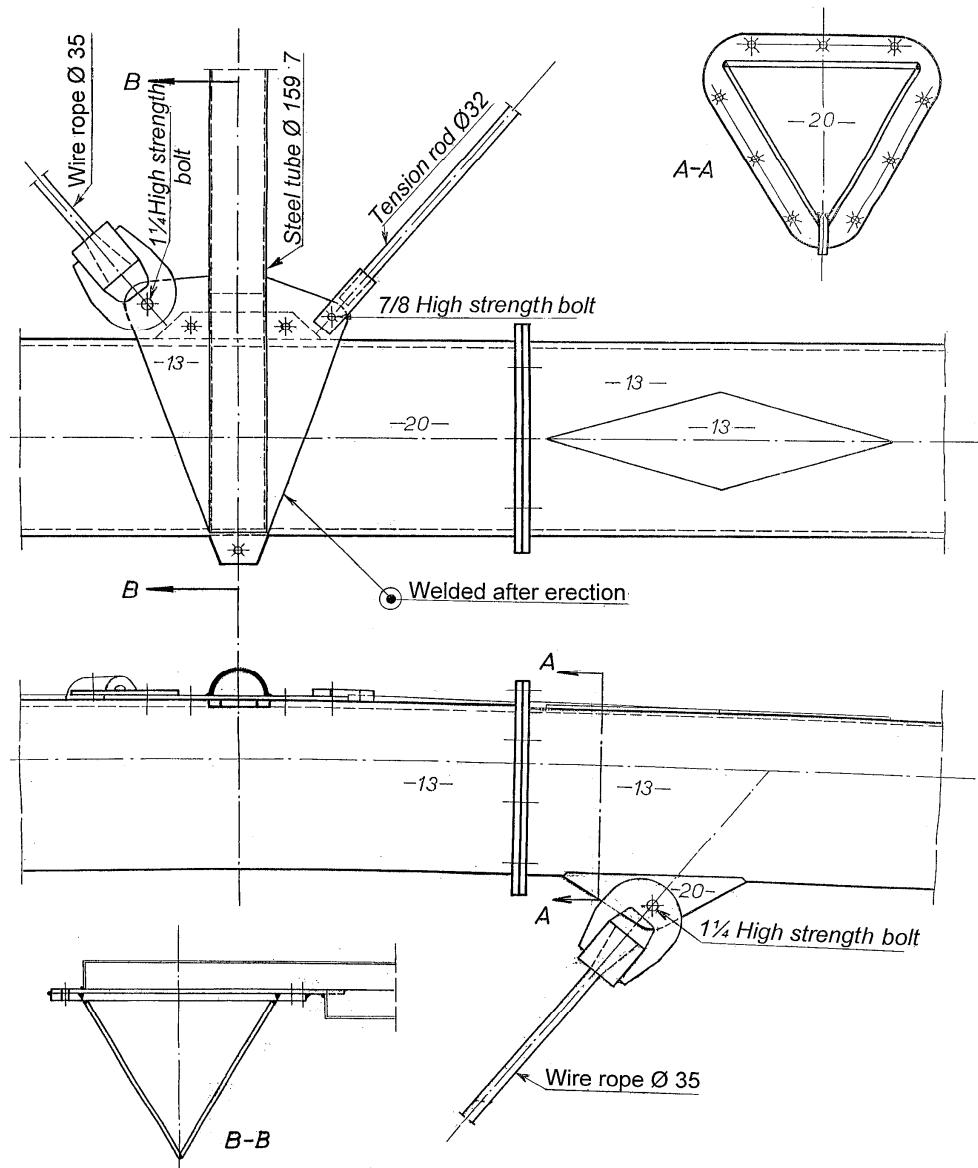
Structural details around the second tube in the windbracing of the network arch in Steinkjer
